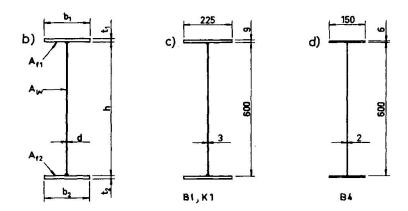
c-d. b) Notations for cross section. c) and d) Girder cross sections for the test girders.
